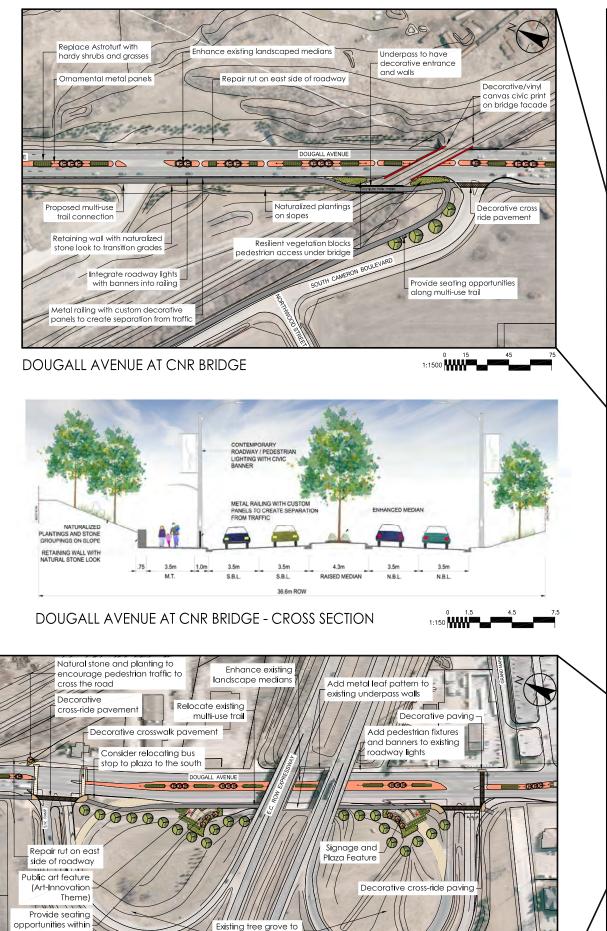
Dougall Avenue Civic Way Improvements
